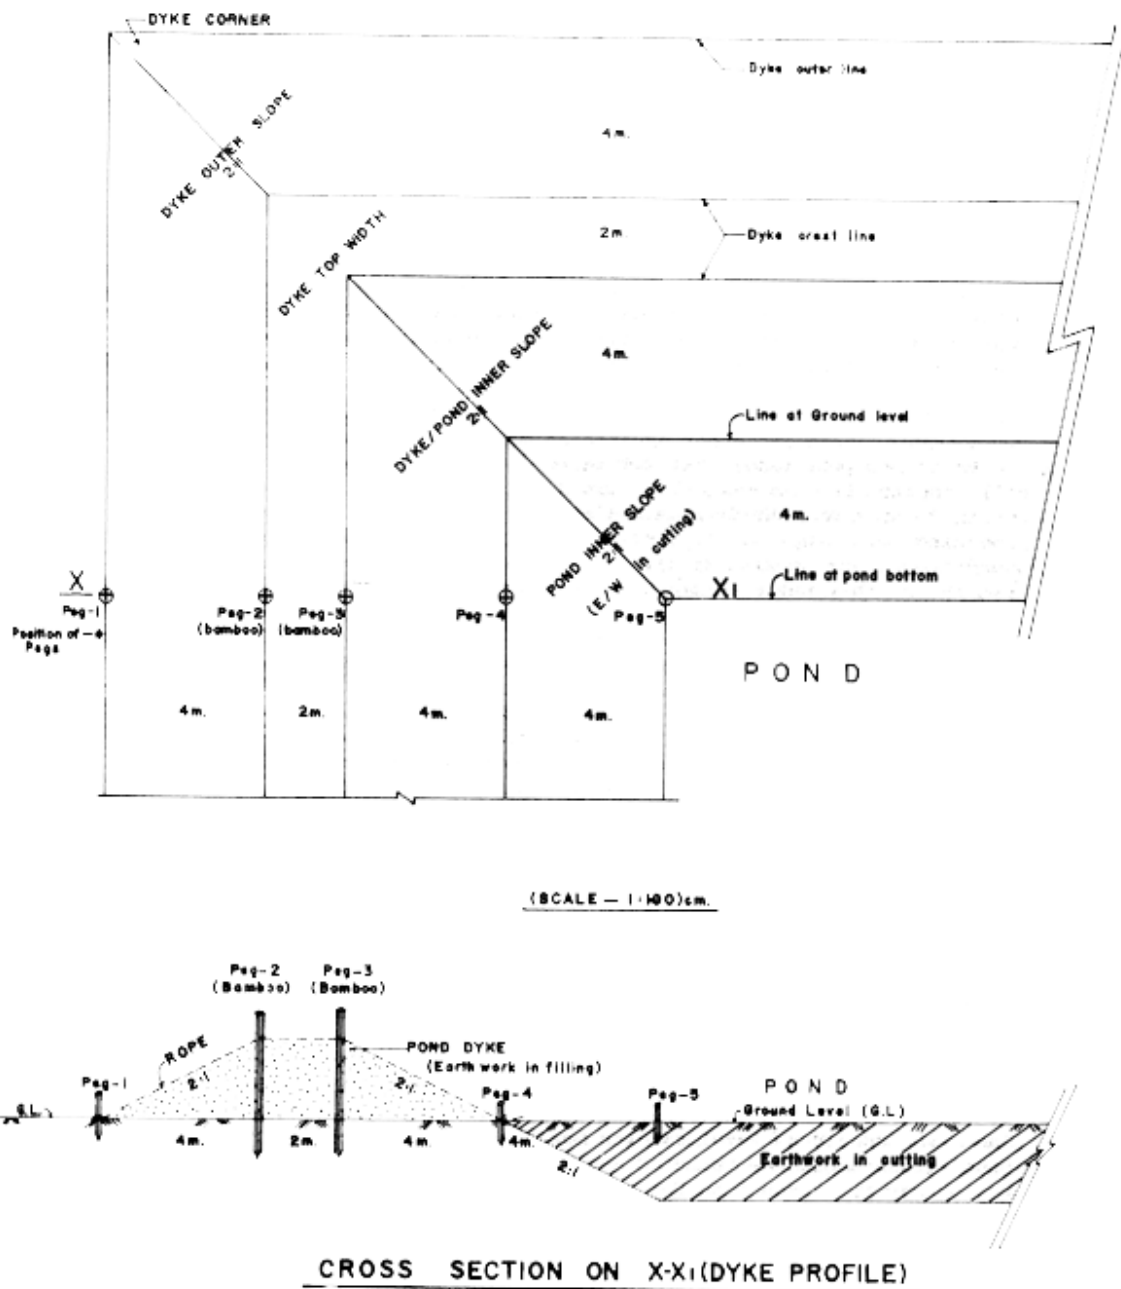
Layout and Pegging before Pond Construction (Corner View)
